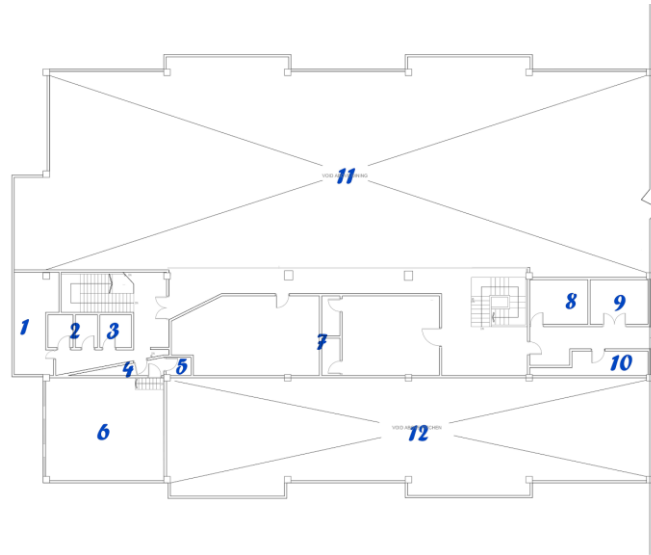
(c) Second Floor Plan Layout (Measure Drawing Group 3 team, Teo 2017)
